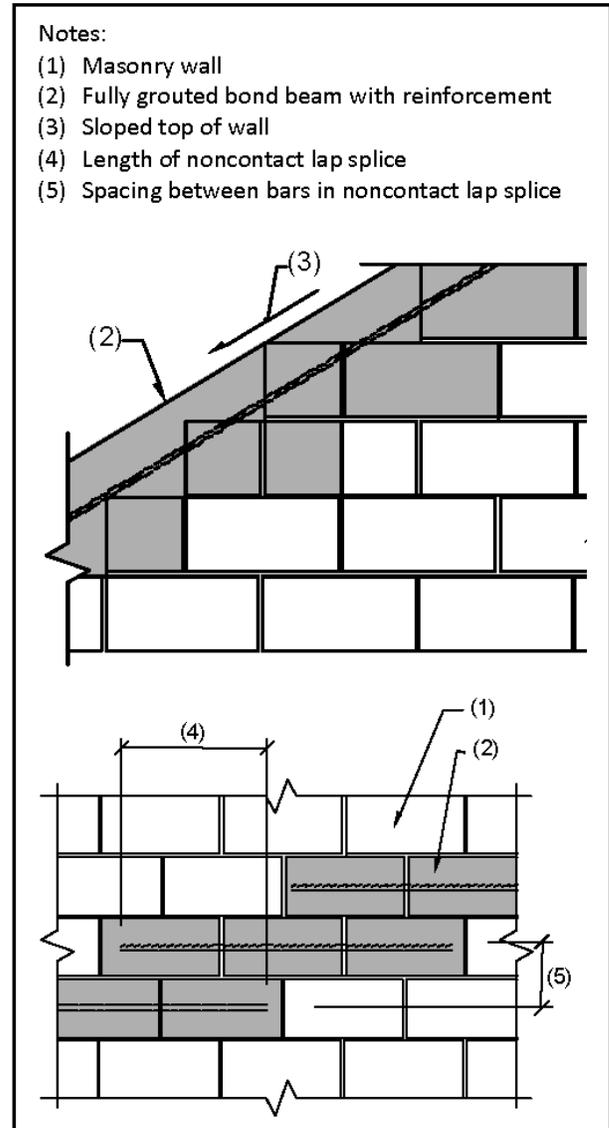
Examples of a sloped bond beam and a stepped bond beam within a masonry assembly.
